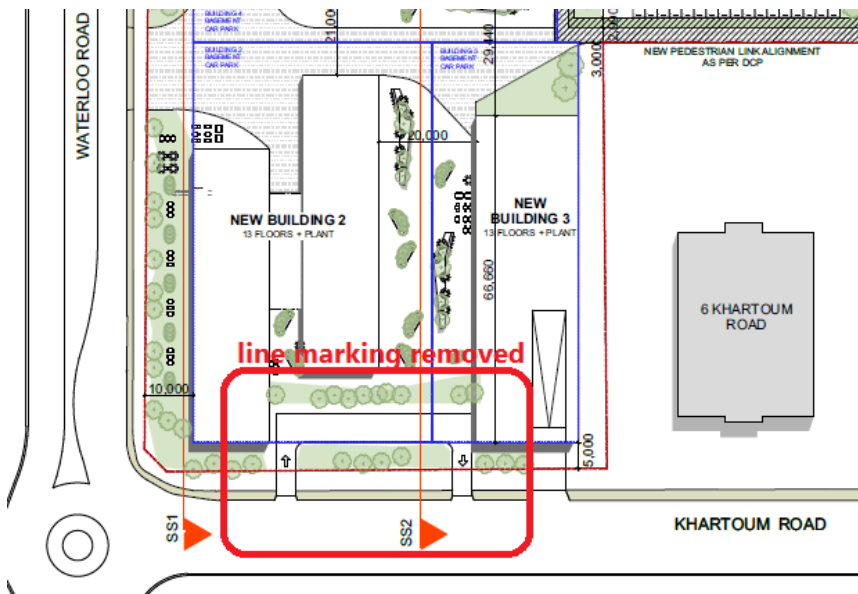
Excerpt of Amended concept DA Plan indicating removal of car parking within the Khartoum Road setback area (Dwg no. DA29, Issue H)
